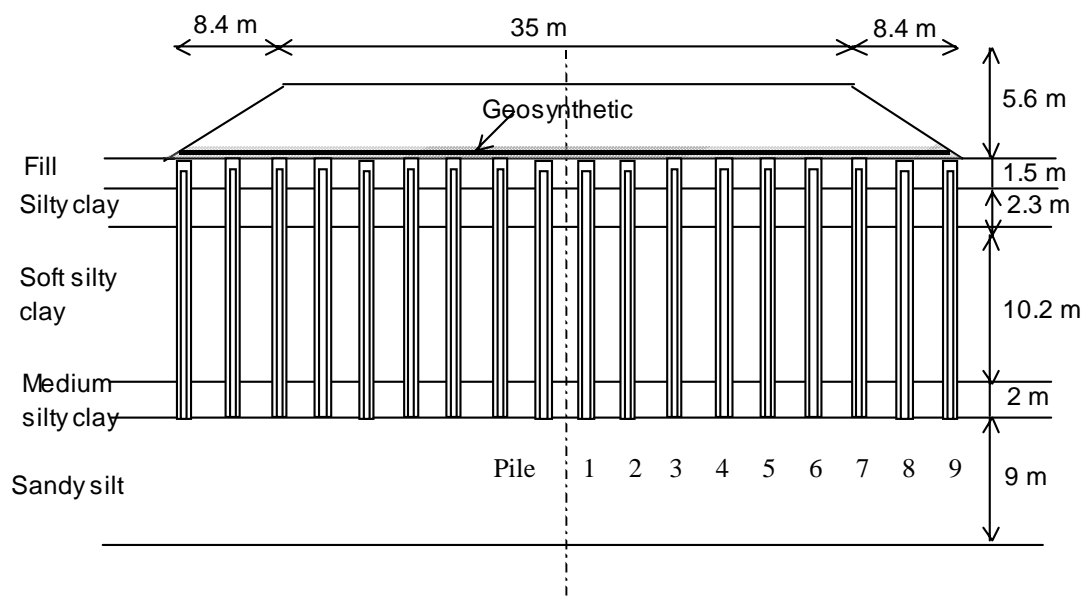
Cross section of the geosynthetic reinforced pile-supported highway embankment.
